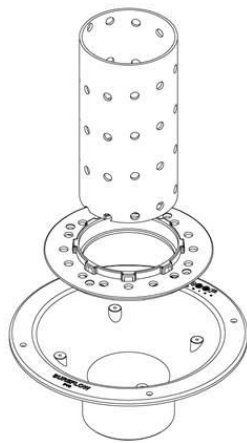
PLANTER BOX CONSTRUCTION
